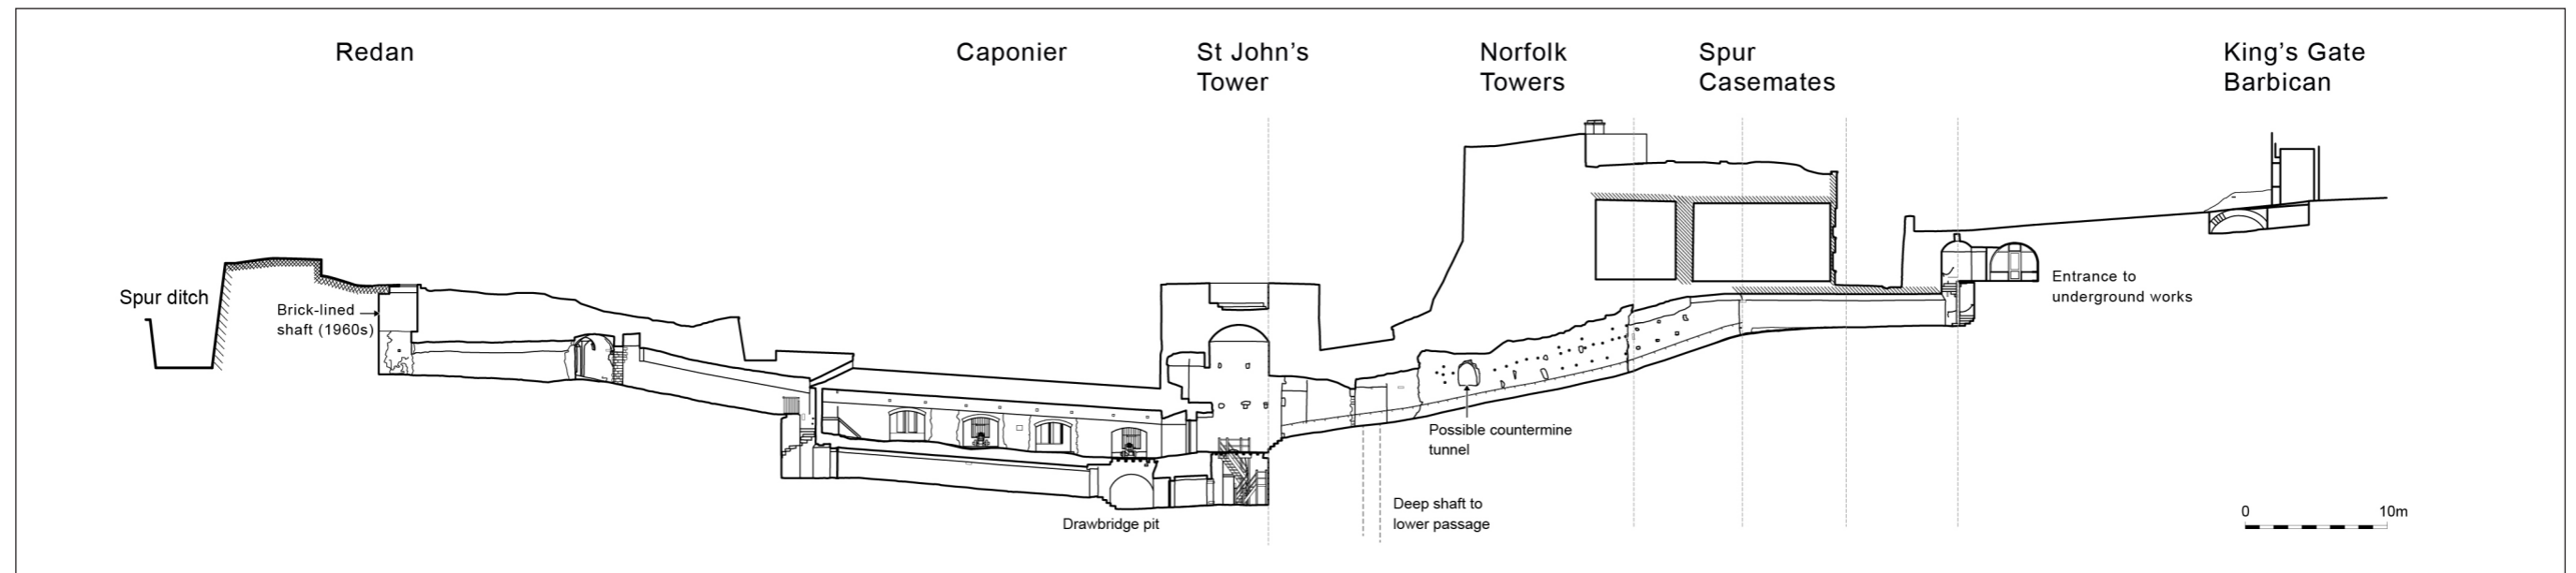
Longitudinal section through redan, caponier, St John's Tower, Norfolk Towers, spur casemates, King's Gate Barbican and tunnel complex.
